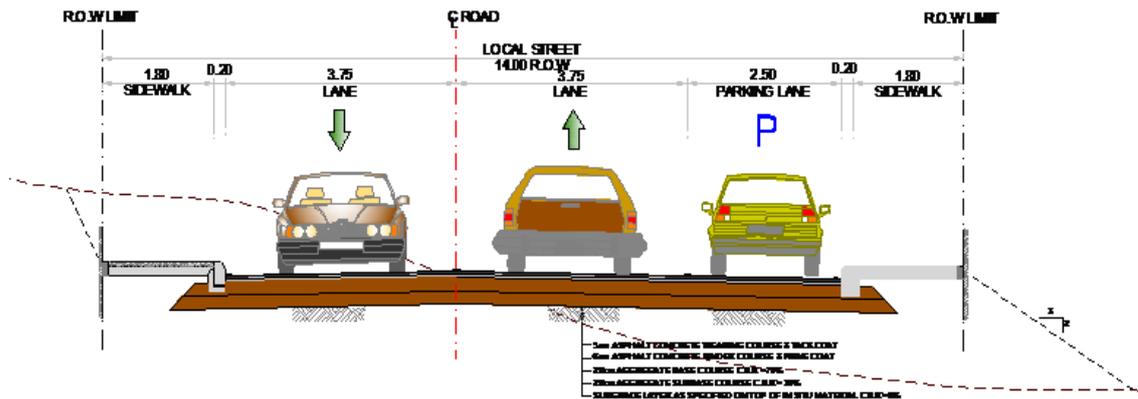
Typical Road Cross-Section for Internal Roads.
